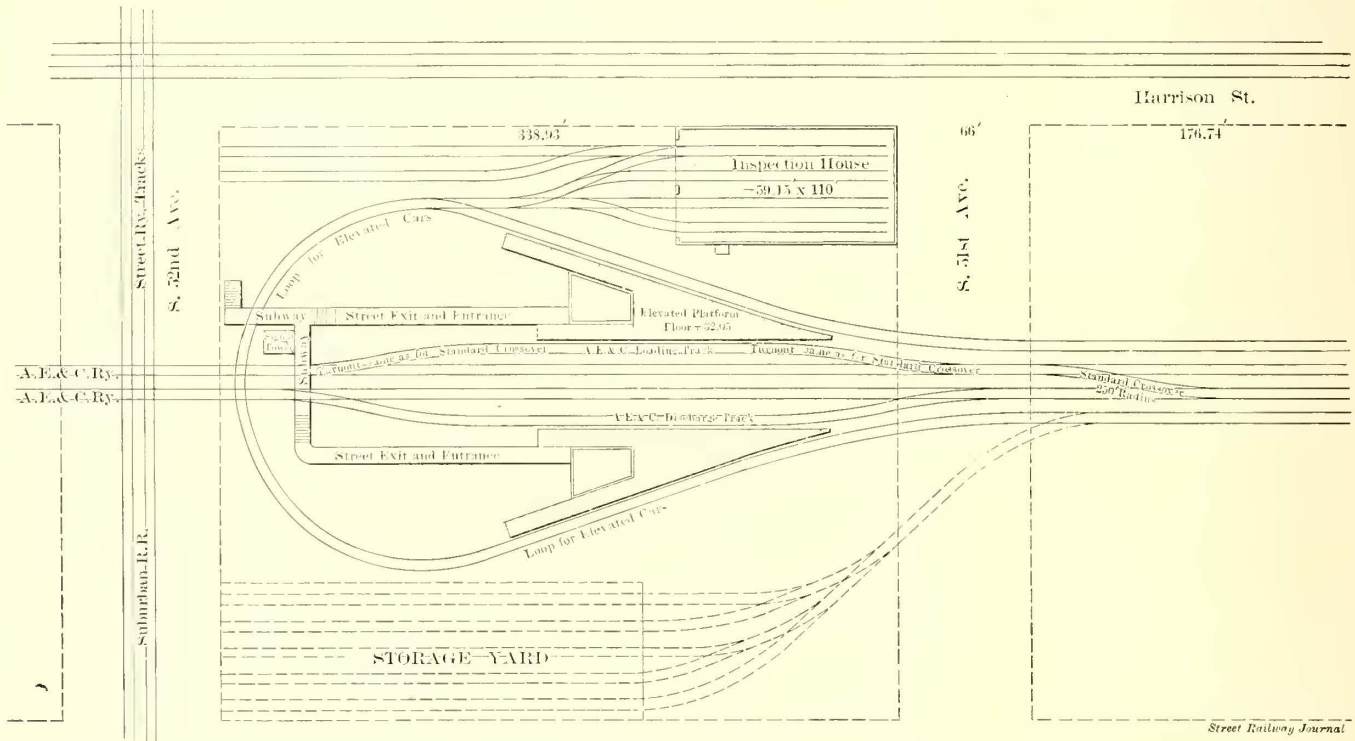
PLAN OF TERMINAL USED BY METROPOLITAN WEST SIDE ELEVATED RAILWAY AND AURORA, ELGIN & CHICAGO RAILWAY AT FIFTY-SECOND AVENUE, CHICAGO
